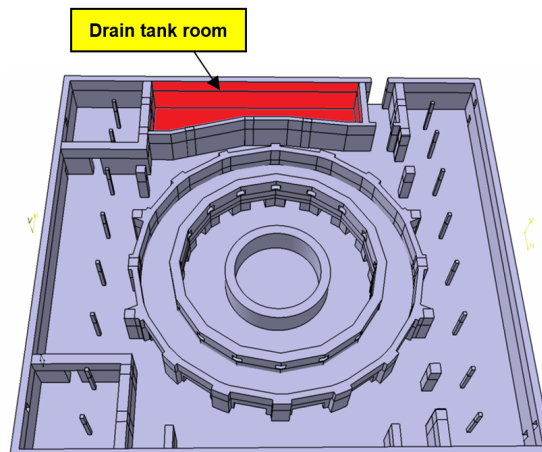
Tokamak building basement level with drain tank room available volume in red
